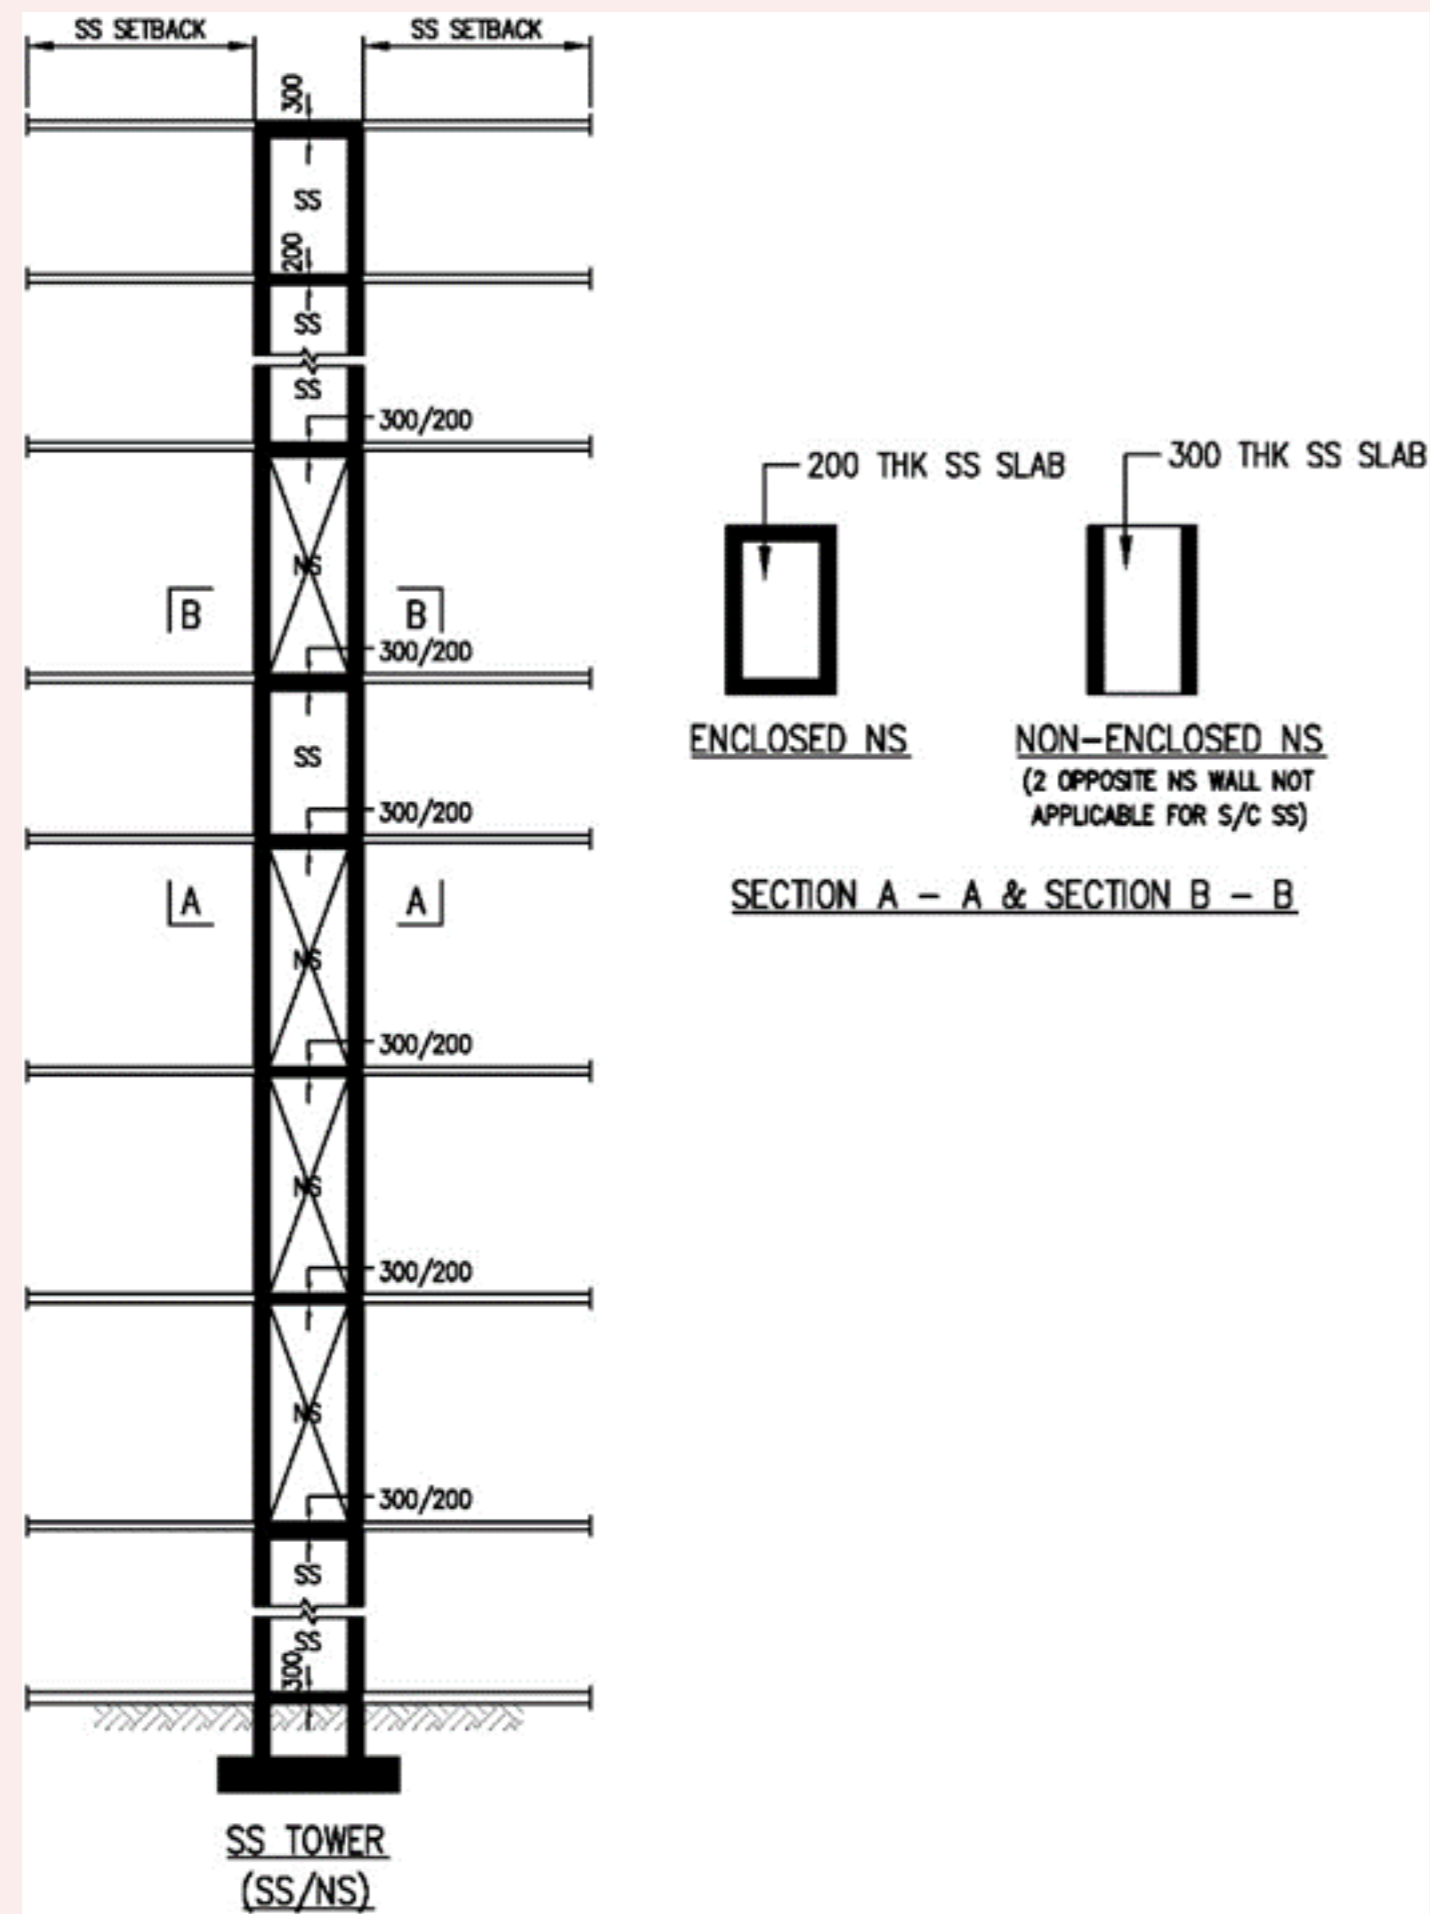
SS TOWER SHOWING SS AND NS (WITH ENCLOSED AND NON-ENCLOSED NS WALL) SLAB THICKNESS
